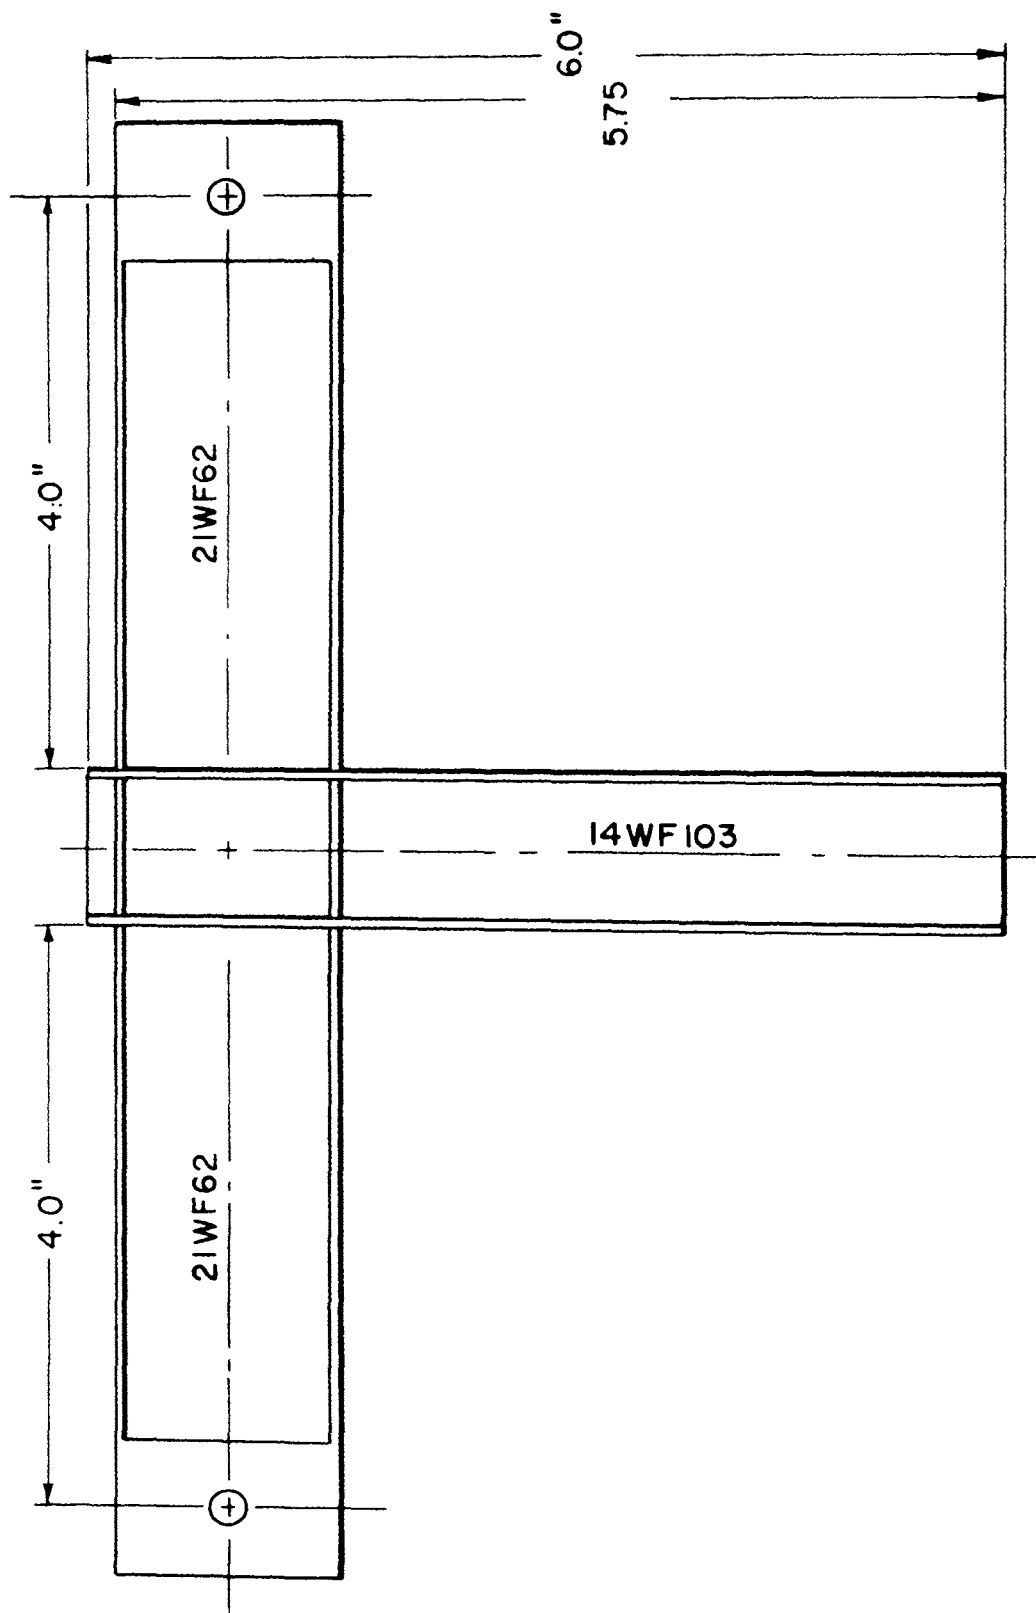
DIMENSION FOR INTERIOR JOINT 14WF103 COLUMN-21WF62 BEAM
